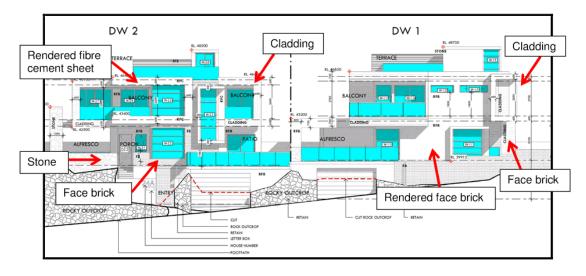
Streetscape elevation (east) to Holland Avenue illustrating building materials used in the area (Source: Space 0.618:1, November 2018)
